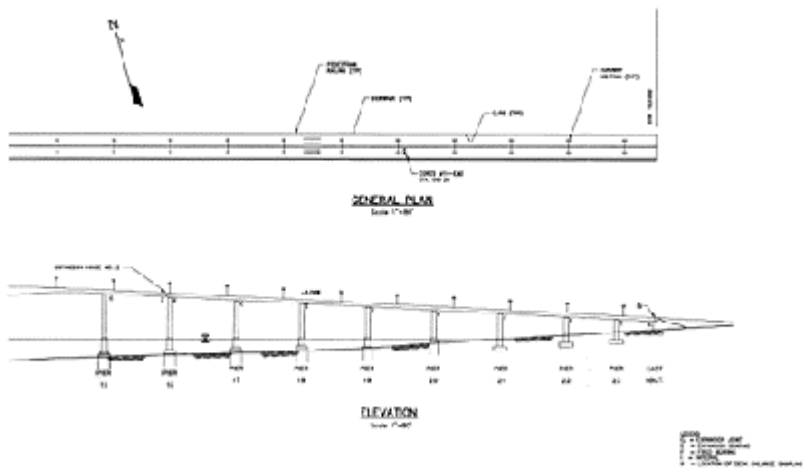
General Plan and Elevation, Main Structure, East Approach Spans.
